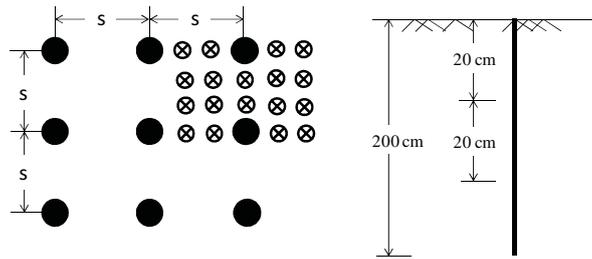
Configuration of pile installation, FVSTs positions, and vertical distance of FVST
